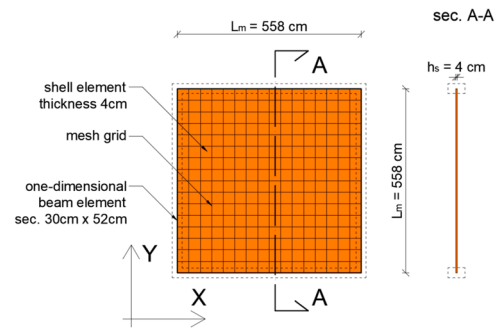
Plan view and cross section of the SM floor cell with 16x16 mesh grid.
